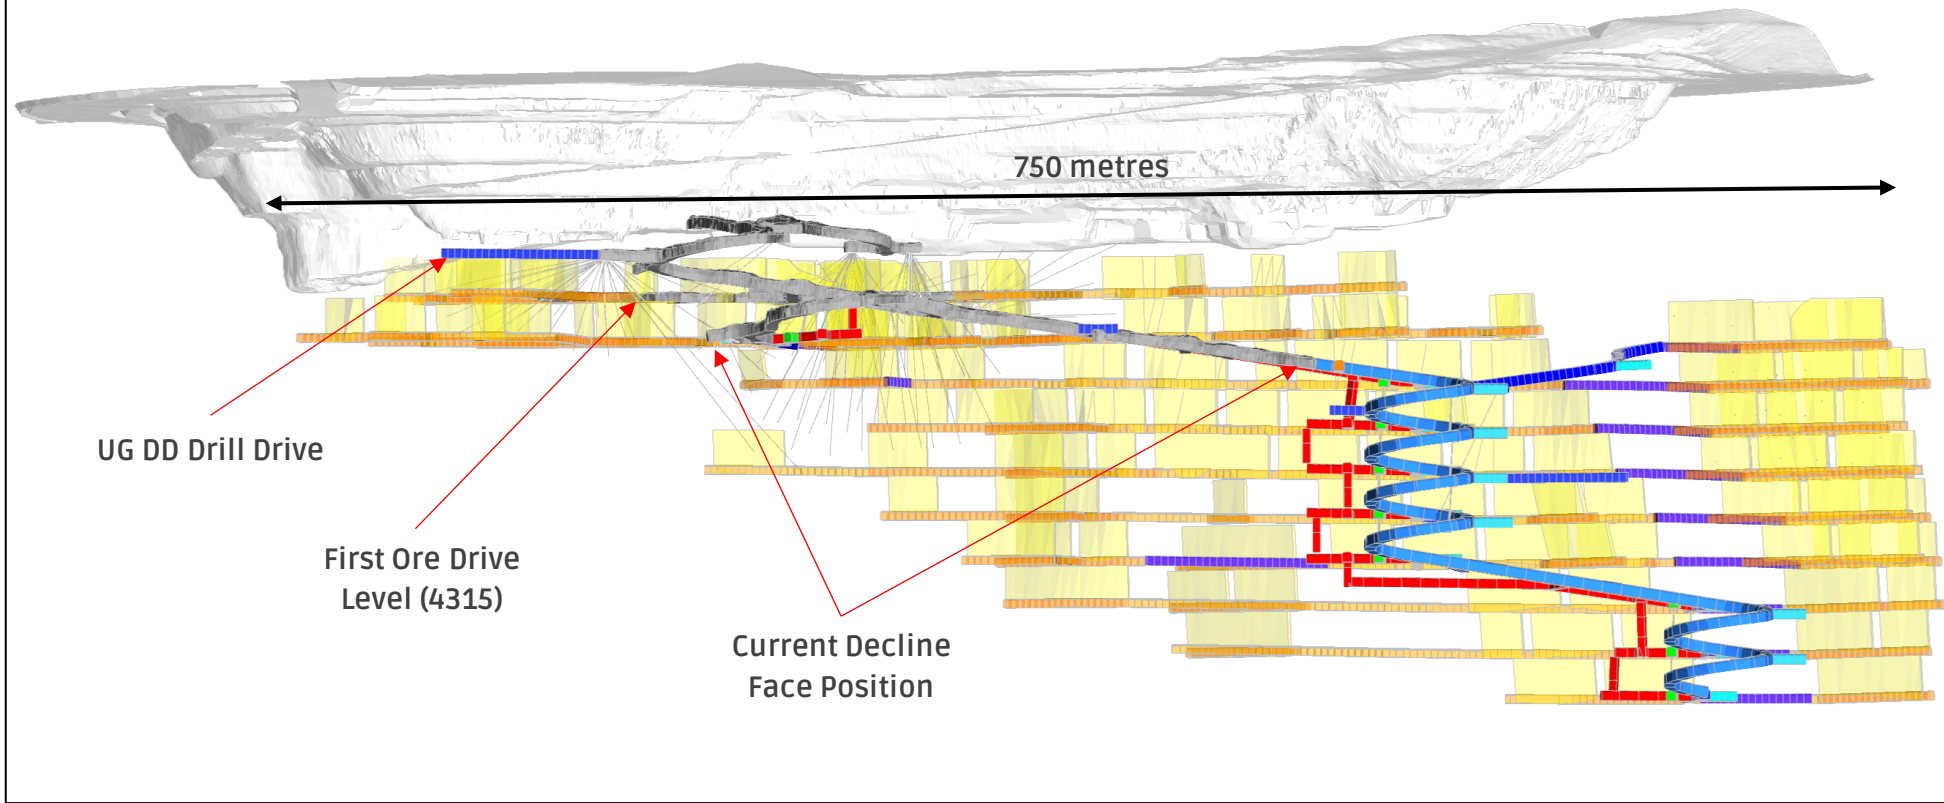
Sand King Underground long section showing actual development and underground mine design.
